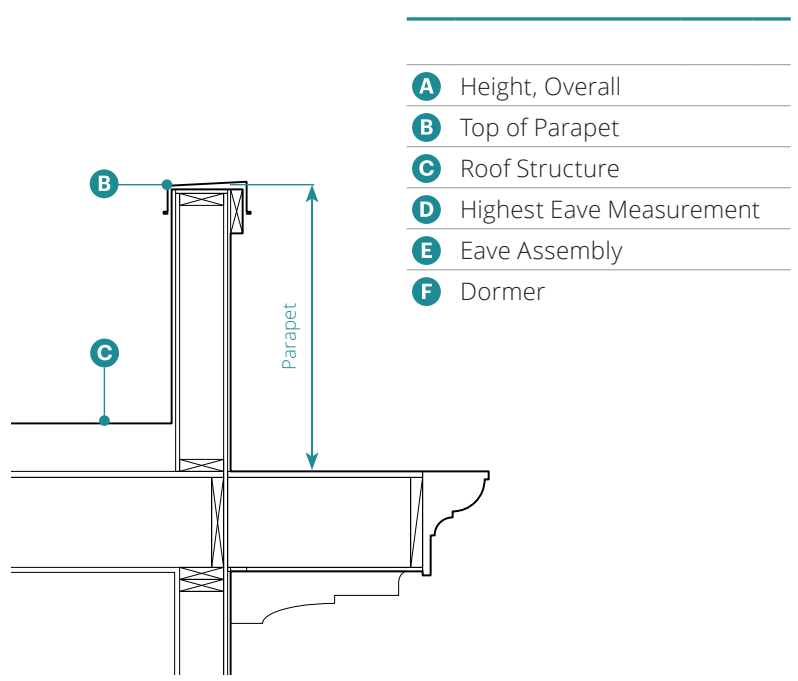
Section Detail of Top of Parapet and Flat Roof
